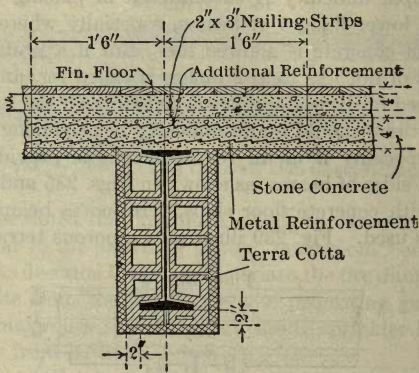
I-Beam Girder Protection, Proposed Appraisers' Stores, Boston.
